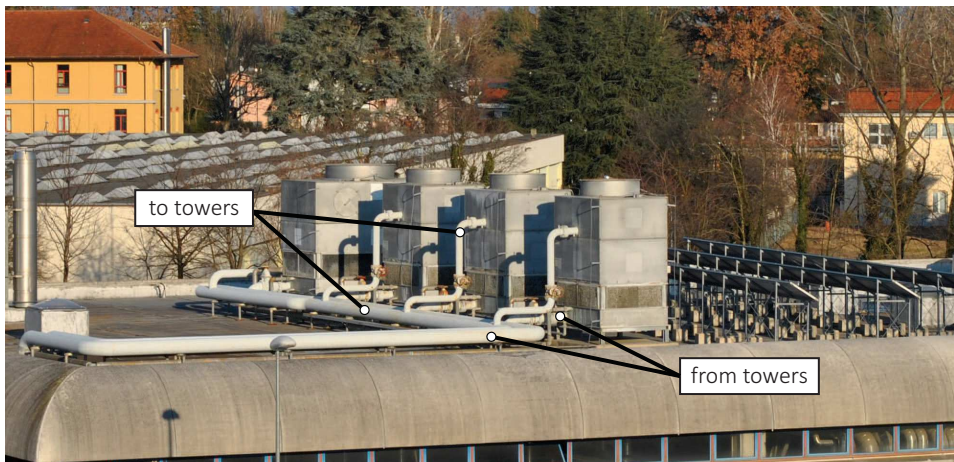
Cooling towers located on the roof of the air conditioning plant's building. Pipes carrying water being sent to the towers and pipes carrying water returning to the system are labelled.
